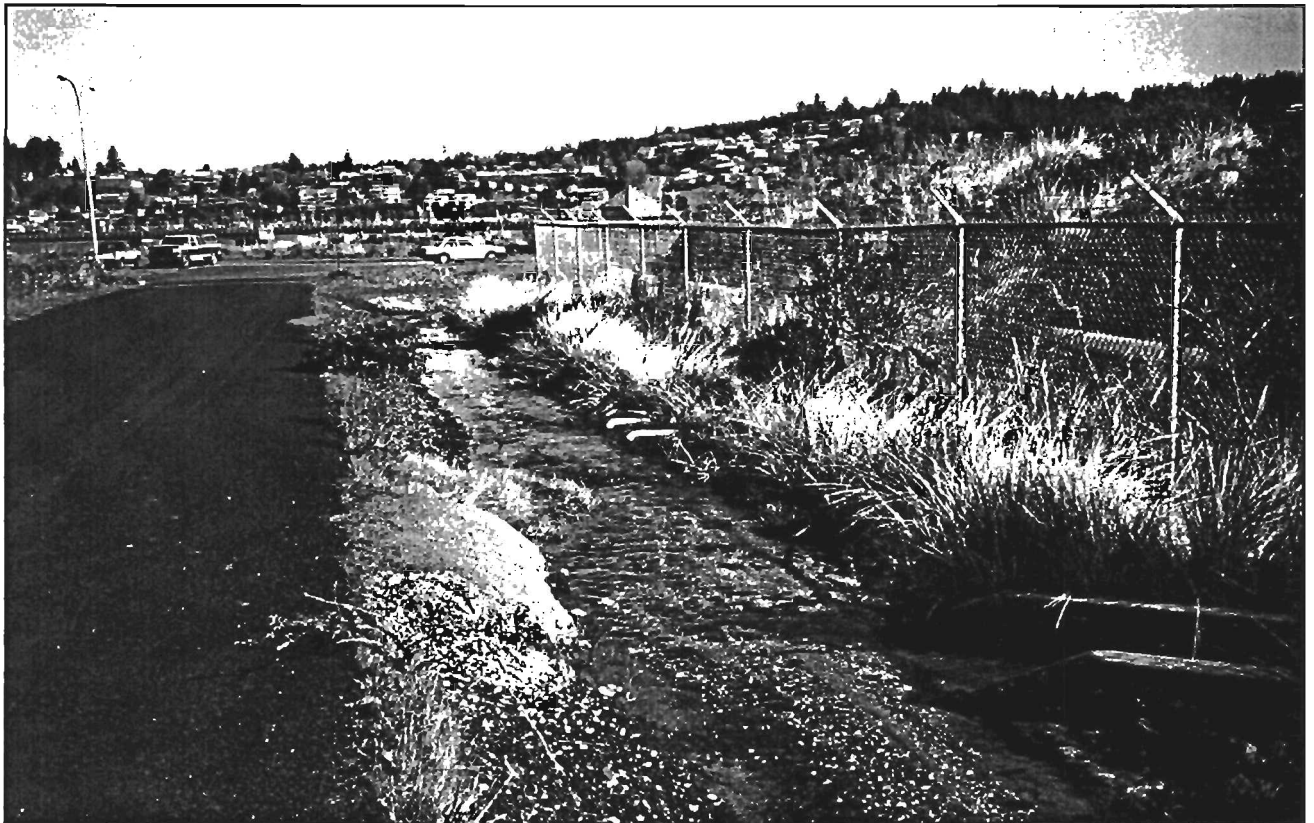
View of seawater drainage channel along westerly boundary of site looking in N direction.
